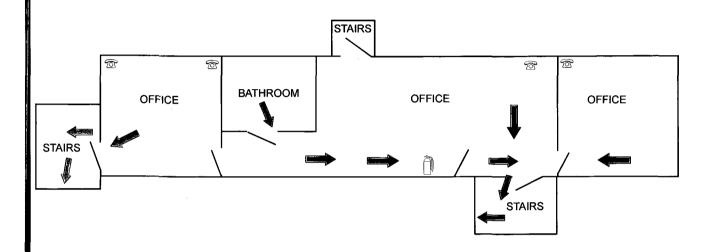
PROCESSING BUILDING EMERGENCY EQUIPMENT & ESCAPE ROUTE
